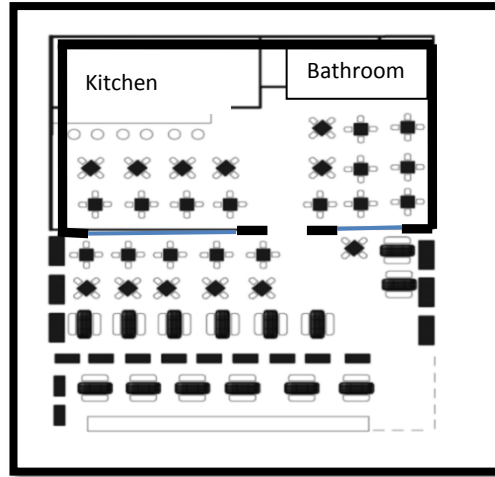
Midpoint Ankara Armada shopping mall layout plan
